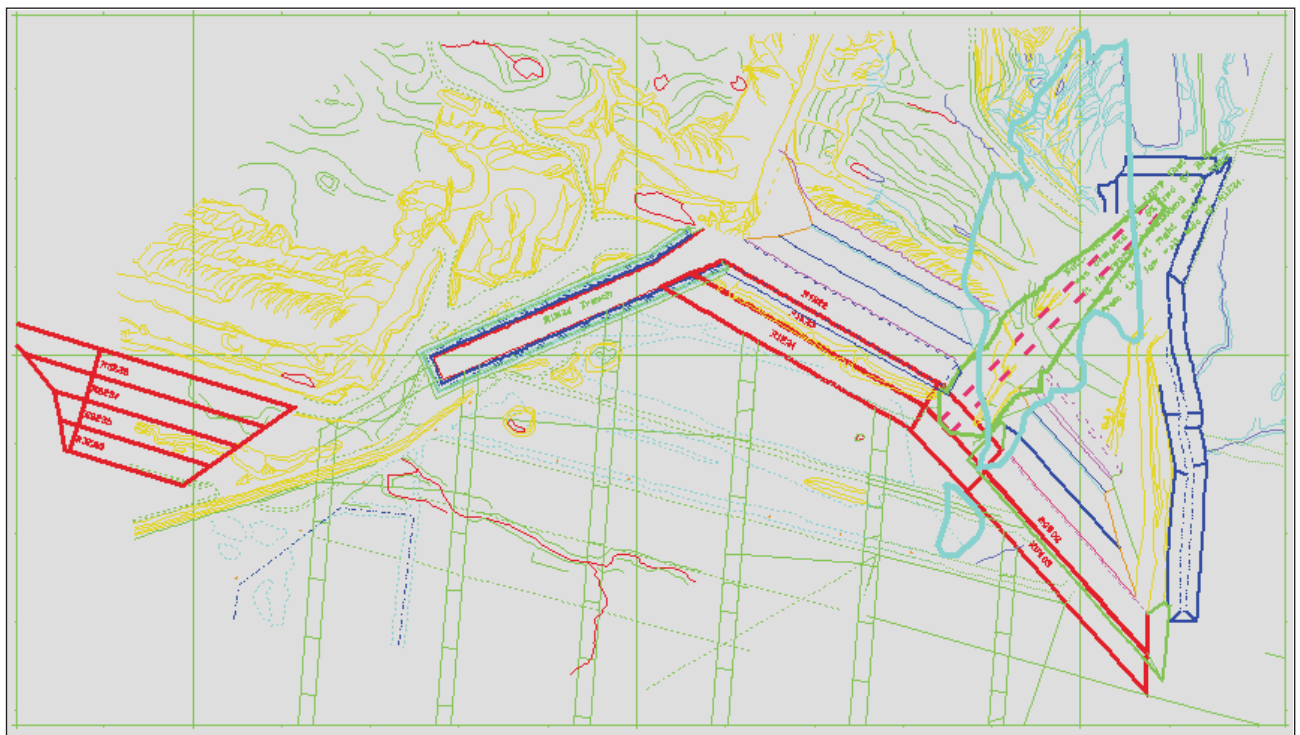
Layout plan view of Crinum East mining block and Gregory pit walls
